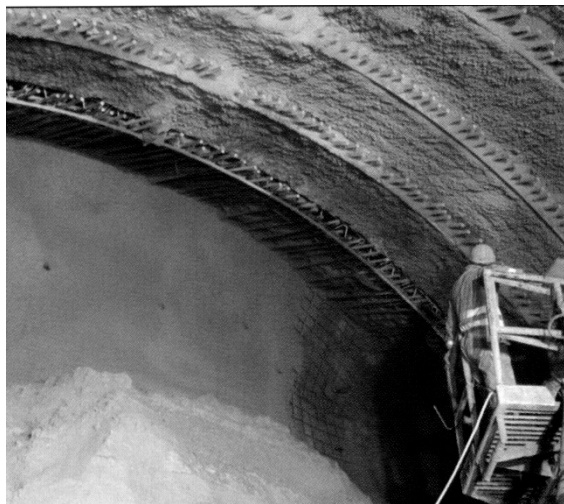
Spiles installed through the lattice girder to the face in every excavation step.
